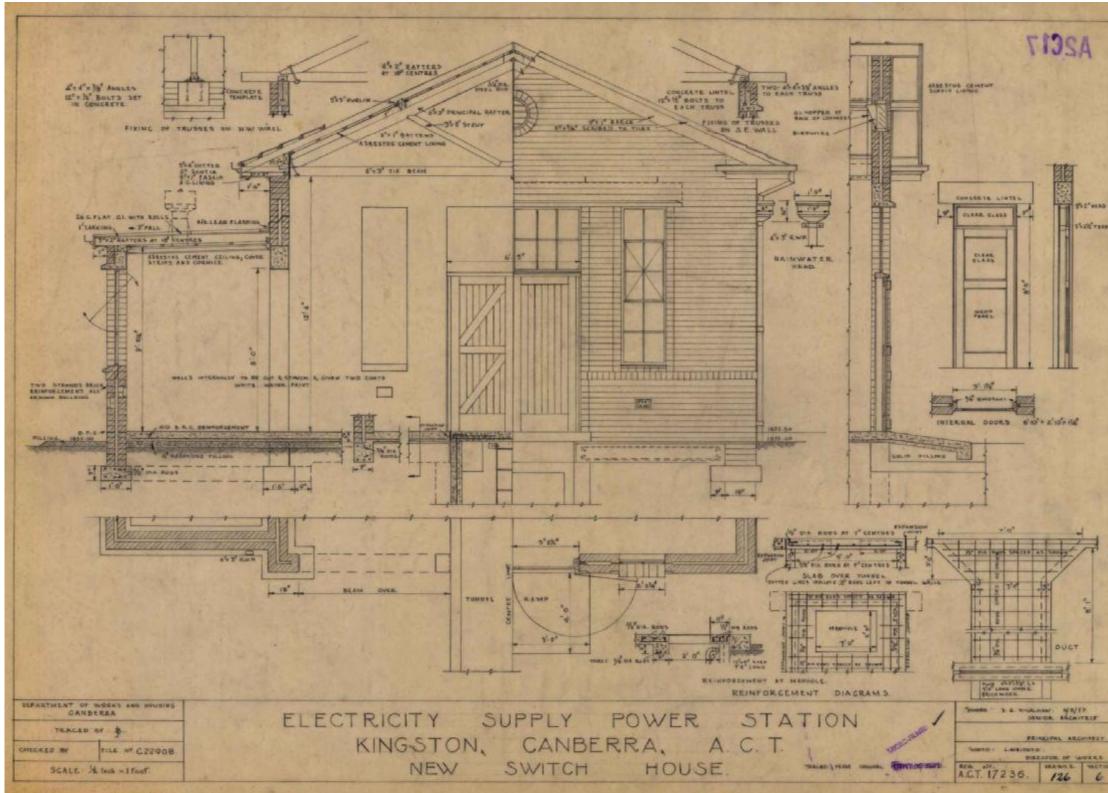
Details: 'Electricity Supply Power Station, Kingston, Canberra, ACT, New Switch House,' Department of Works and Housing, Canberra, 11 August 1947. Source: National Archives of Australia.
